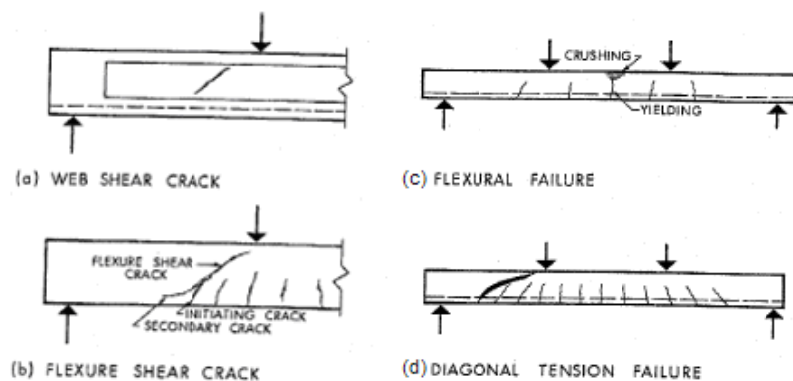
Types of inclined cracks and failures of slender beams: (a) web shear crack; (b) flexure shear crack; (c) flexural failure; (d) diagonal tension failure. (ASCE-ACI committee 426, 1973).
